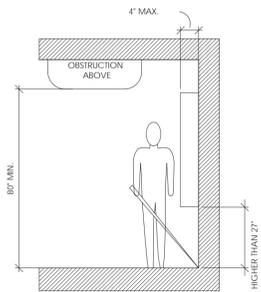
WALL OBJECTS MOUNTED WITH THEIR LEADING EDGE HIGHER THAN 27" MUST NOT PROTRUDE MORE THAN 4" FROM THE WALL.
